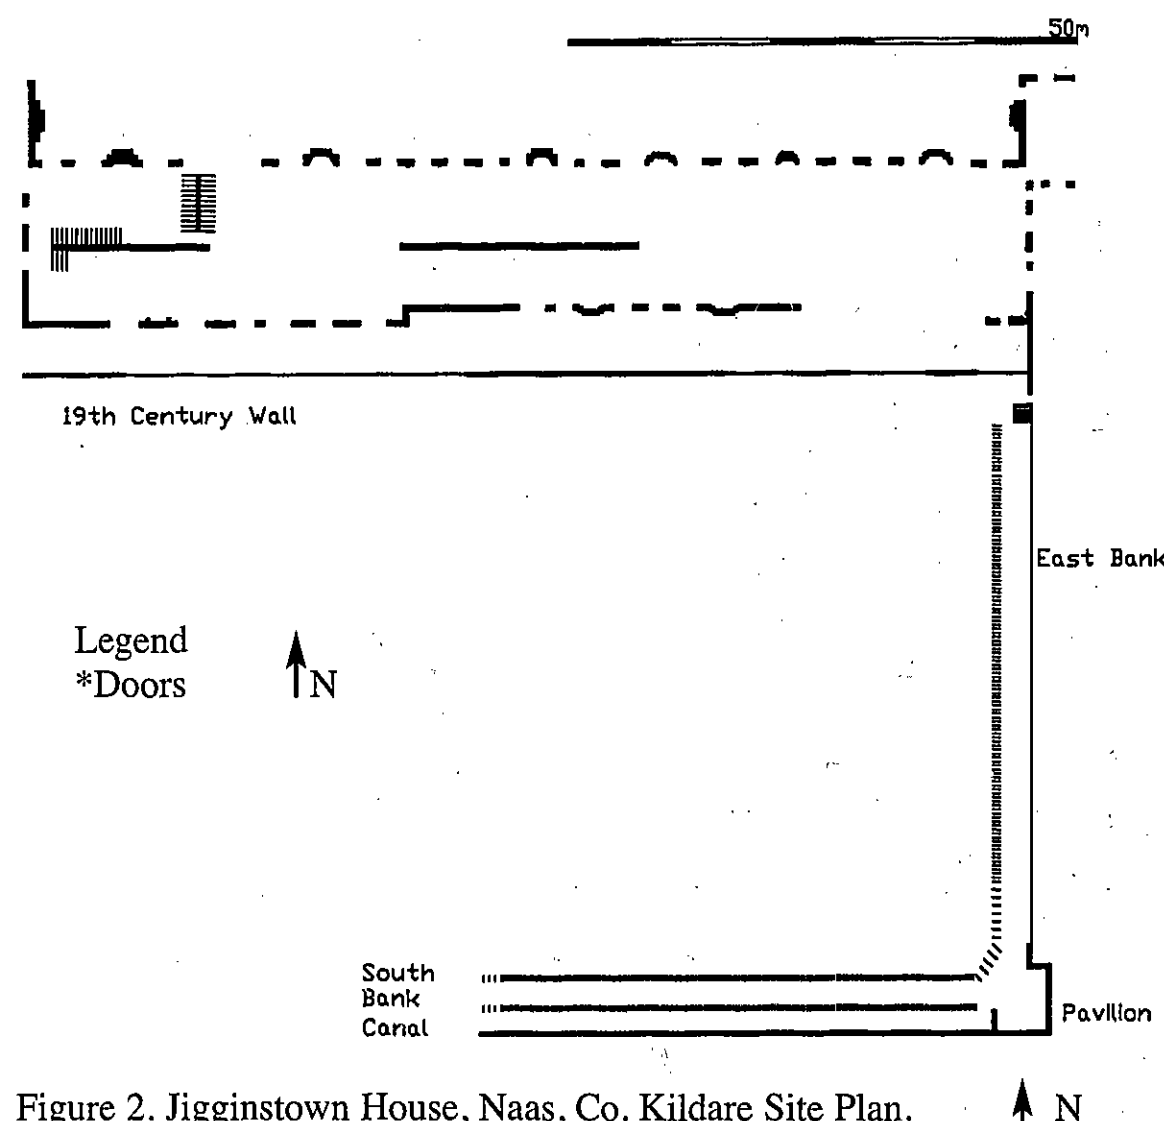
Jigginstown House, Naas, Co. Kildare Site Plan.
